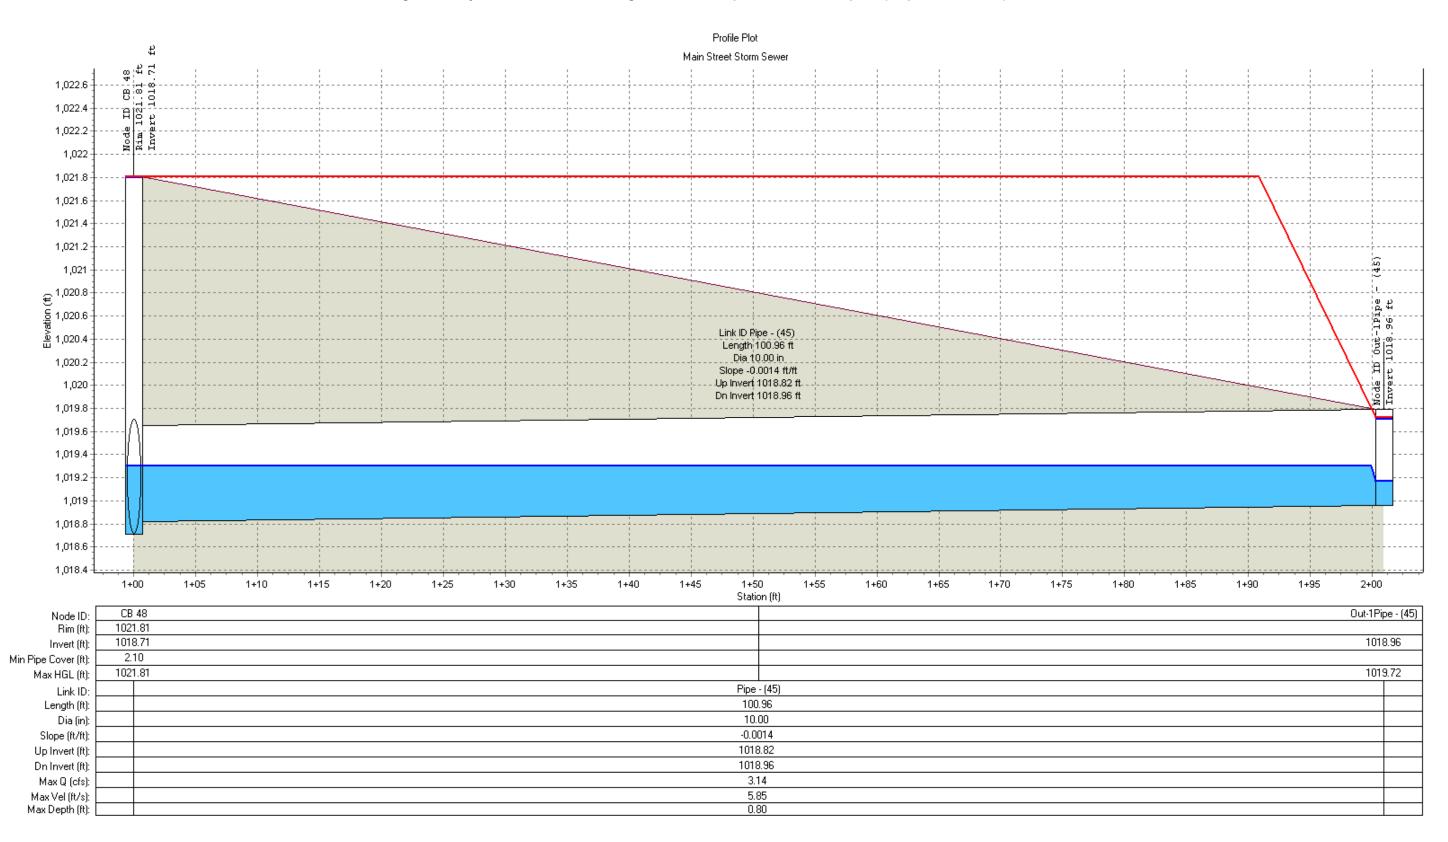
Hydraulic Profile - Surcharged Manholes/Pipe CB48 to Out1Pipe45 (sloped backwards)
